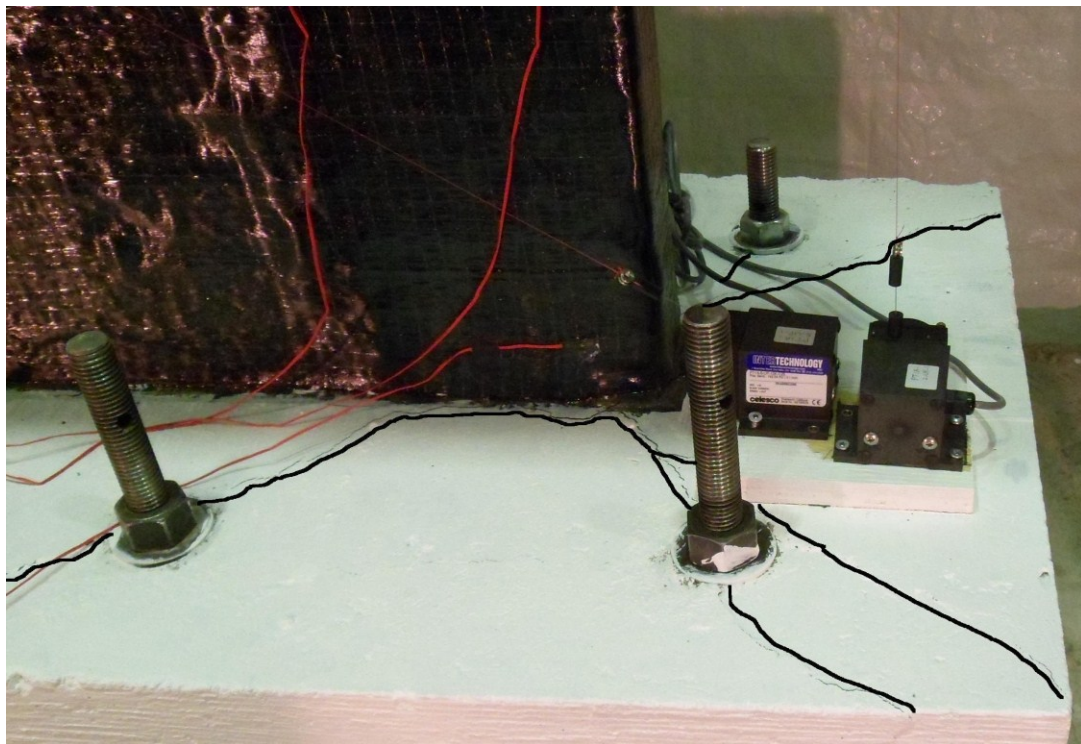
Local cracking of the footing of the retrofitted wall RW1 at its maximum load.
